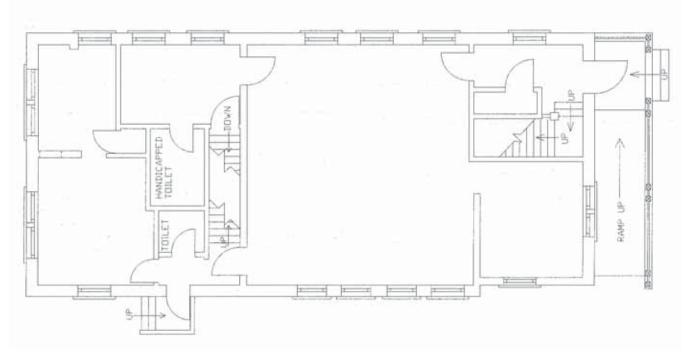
1st Floor Plan from August 1998 Floor Plan drawings, Sheet A-1 (N.T.S.)
